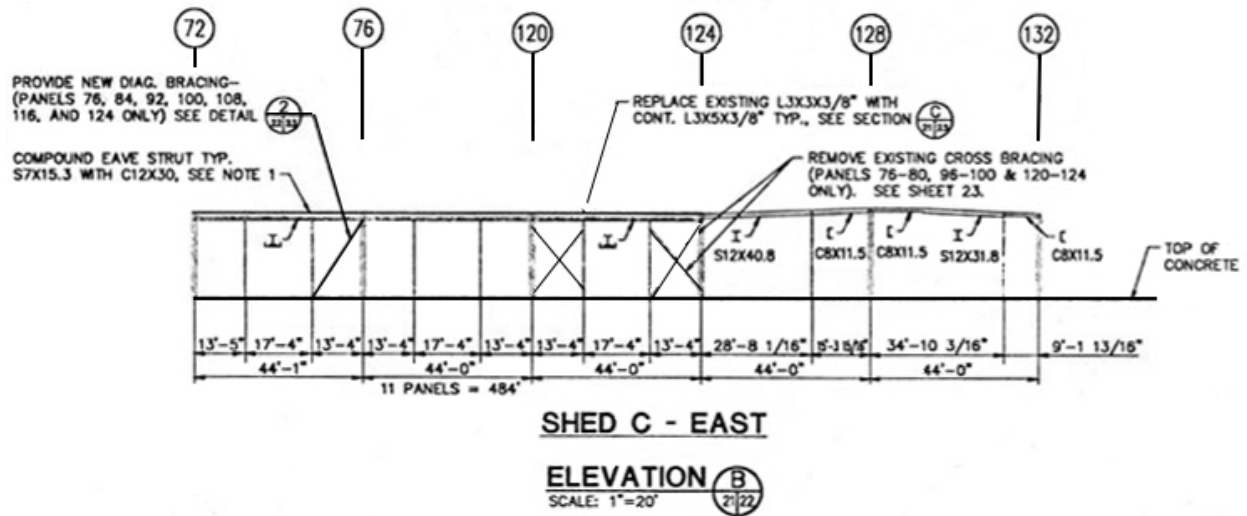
Shed C spans and retrofit installed in the east direction.
